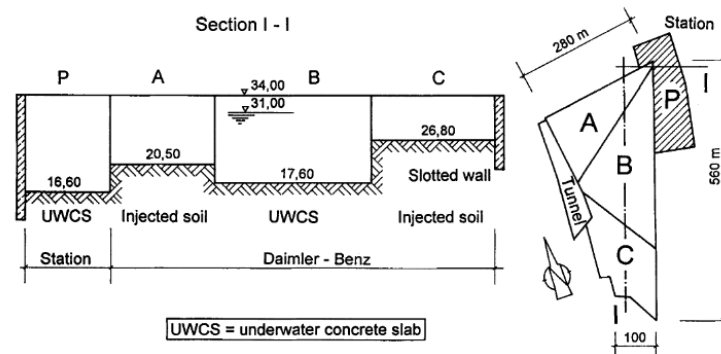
Cross-section (left) and top view (right) of building pit Potsdamer Platz [21]
